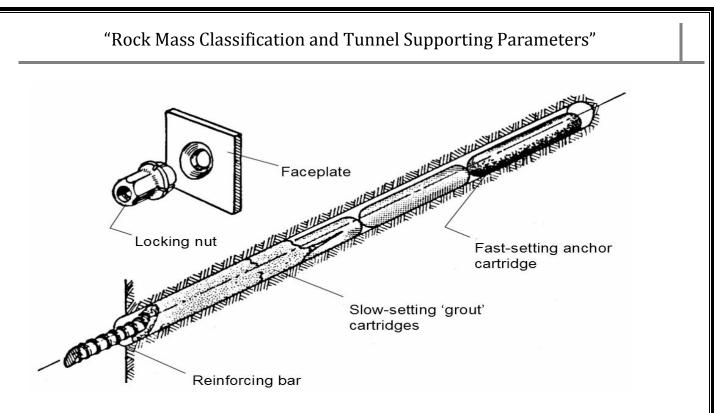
Typical set-up for creating a resin anchored and grouted rock bolt (Source: Engineering Hook)
